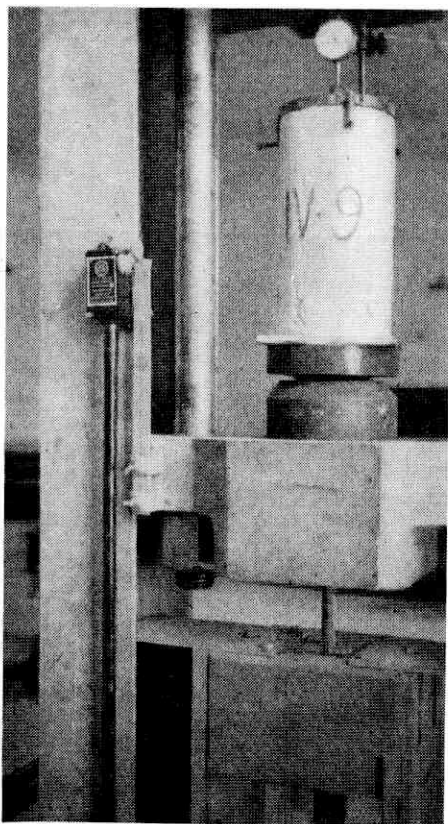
PULL-OUT TEST PIECE UNDER TEST IN 60 KIP FATIGUE MACHINE. Load recorder and fatigue attachment not shown.
